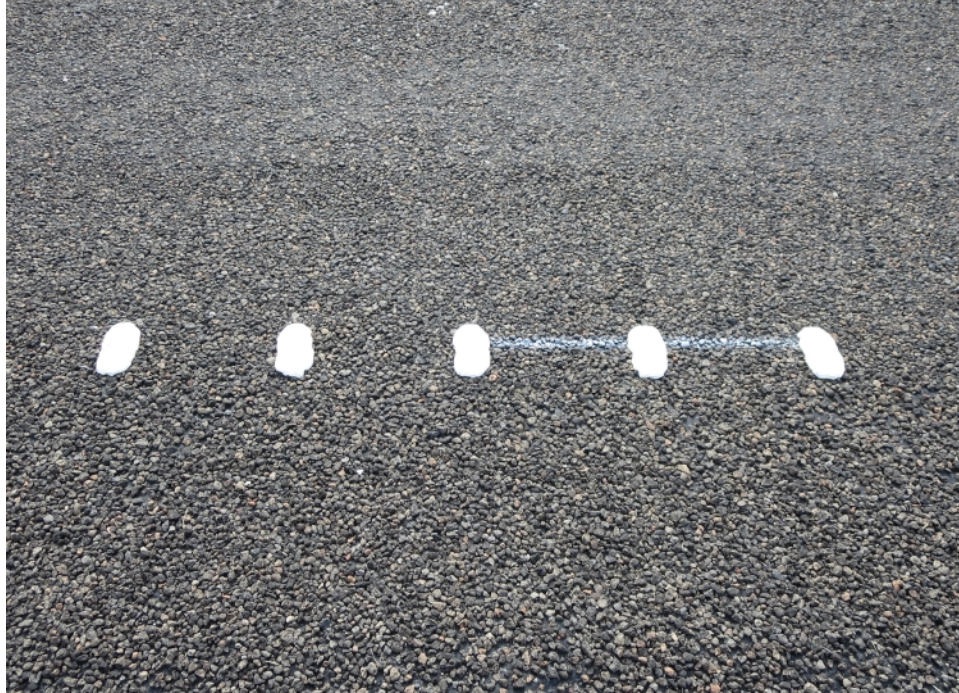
Profile Bumps prior to Solid Line Installation (Standard Spacing, Section WB1).
